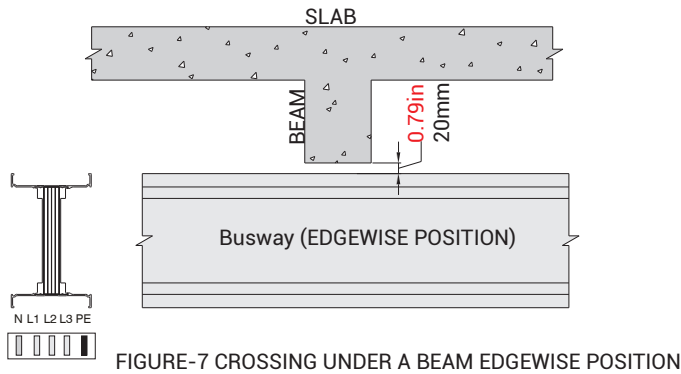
CROSSING UNDER A BEAM EDGEWISE POSITION
